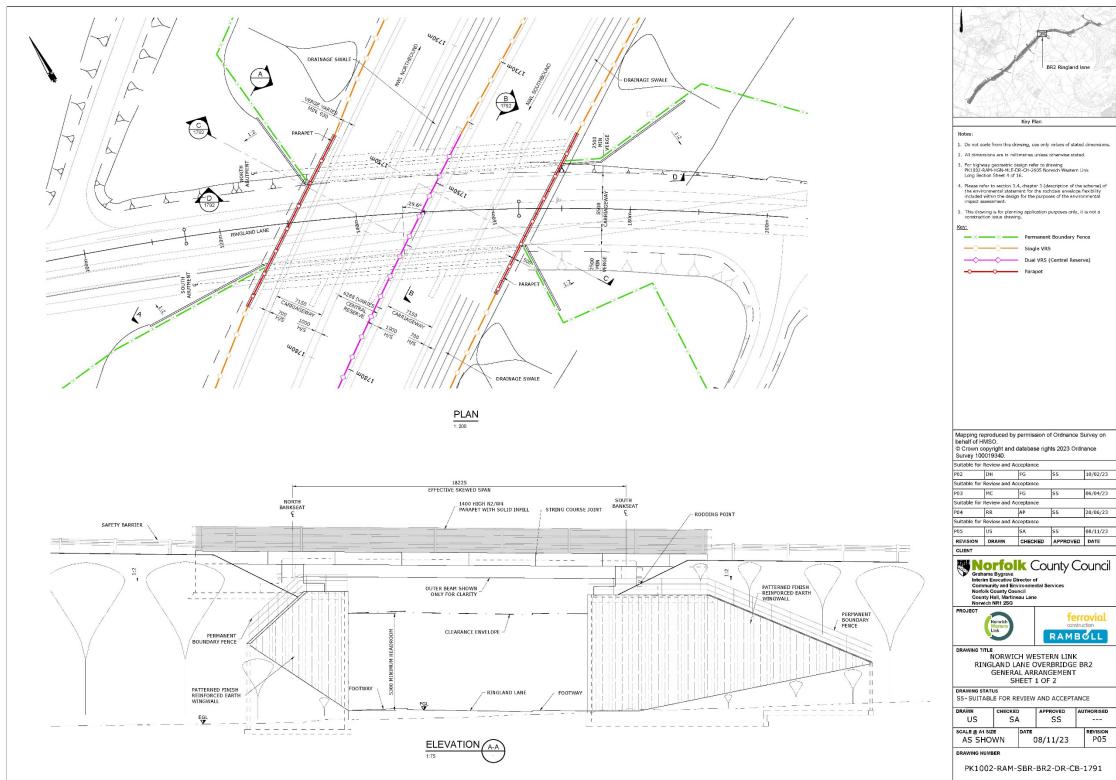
The General Arrangement Drawings for Ringland Lane Overbridge BR2, illustrating the structural cross section of the overbridge
